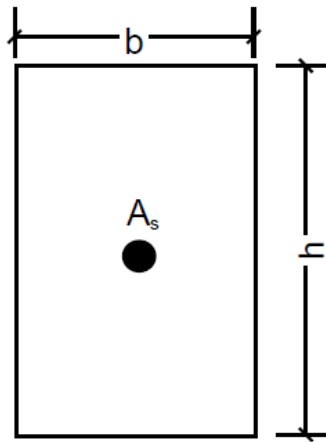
A concrete cross section with a prestressing force applied at its centroid
